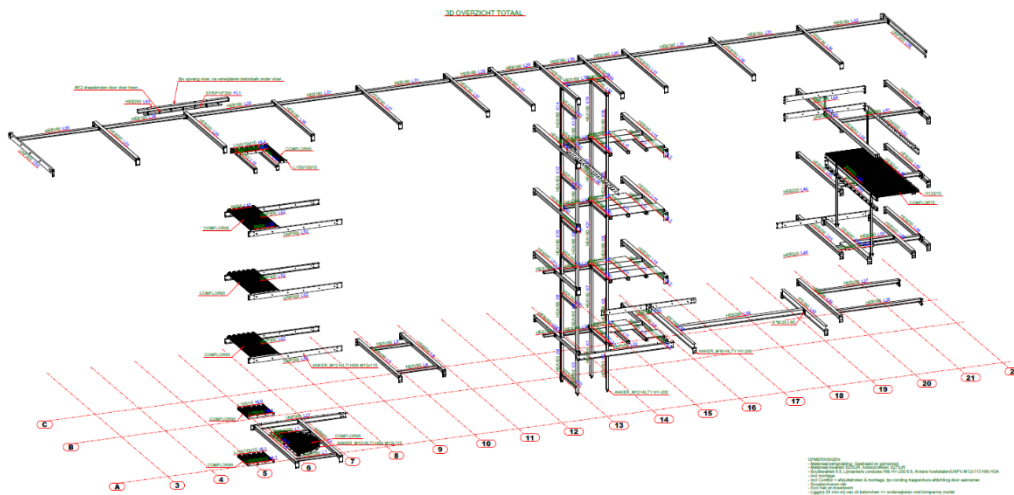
3D overview of the reinforced steel structure in the building REC-P (Blijleven, 2022).
